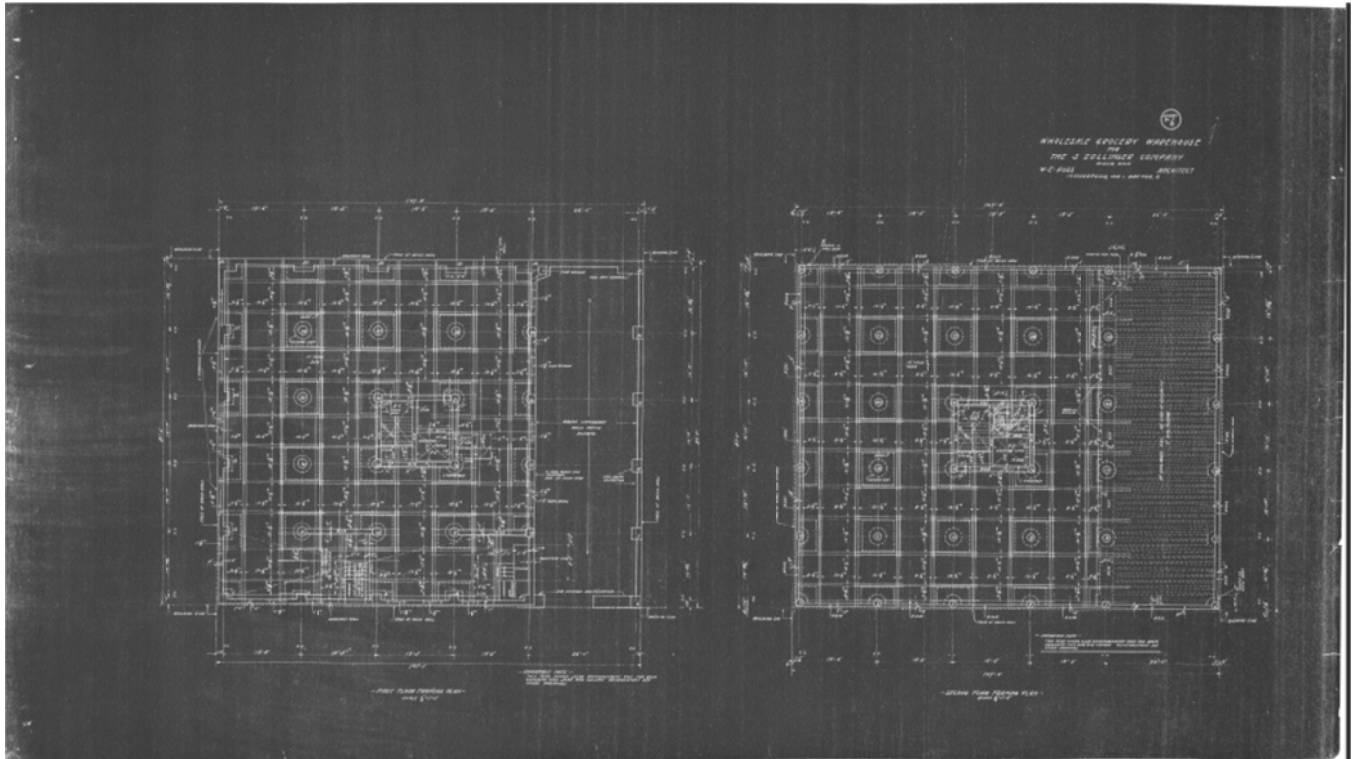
Reflected ceiling plans showing structural layout of the Zollinger Building prepared by William Earl Russ, Architect, in 1914.
